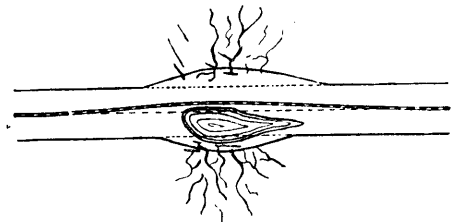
Plan of Sink-Hole Showing Distortion in Alignment, and Cracks at Sides.
